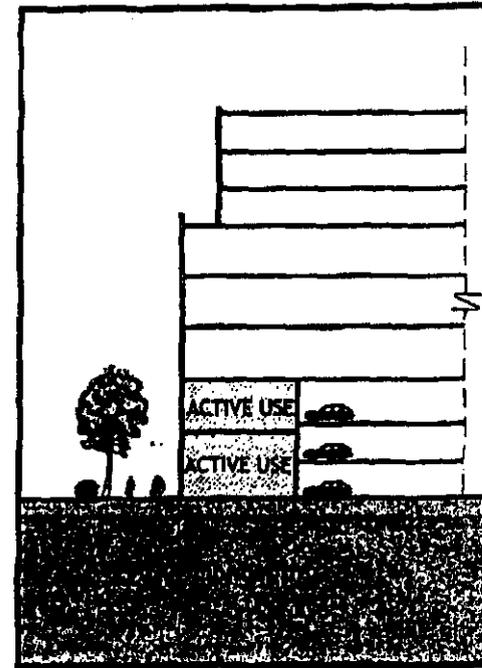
Section showing active use on street frontage; parking garage is not visible from the street
